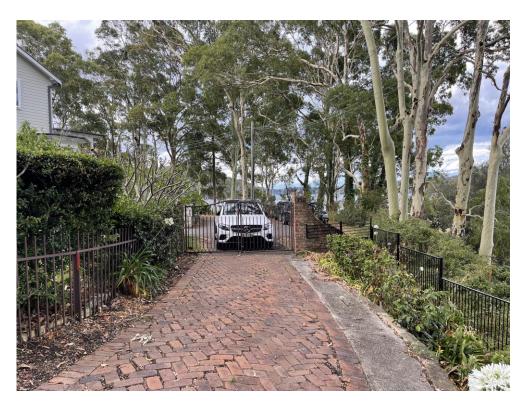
View of the existing driveway and driveway access from Pittwater Road, looking north-east
